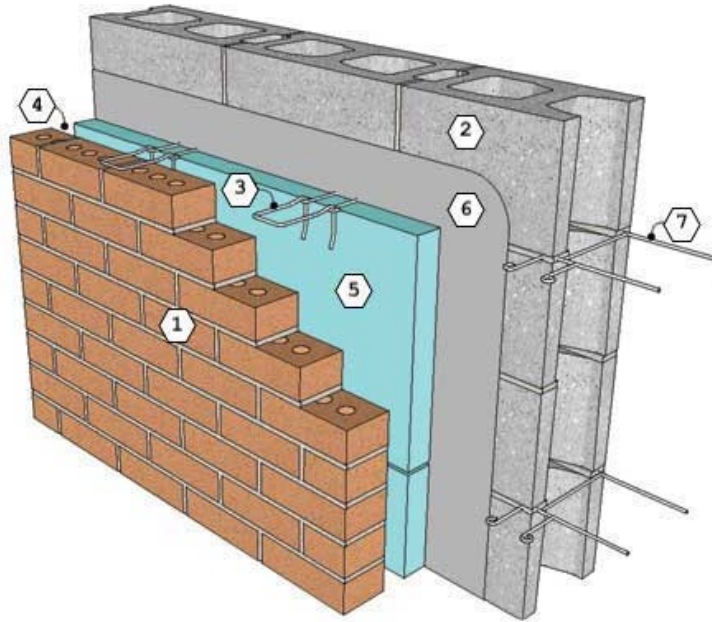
Cavity-wall details. (1) clay brick veneer; (2) concrete block backup; (3) wall ties; (4) air gap; (5) insulation; (6) vapour barrier; (7) horizontal joint reinforcement; (8) shelf angle (Construction Canada, 2022)
